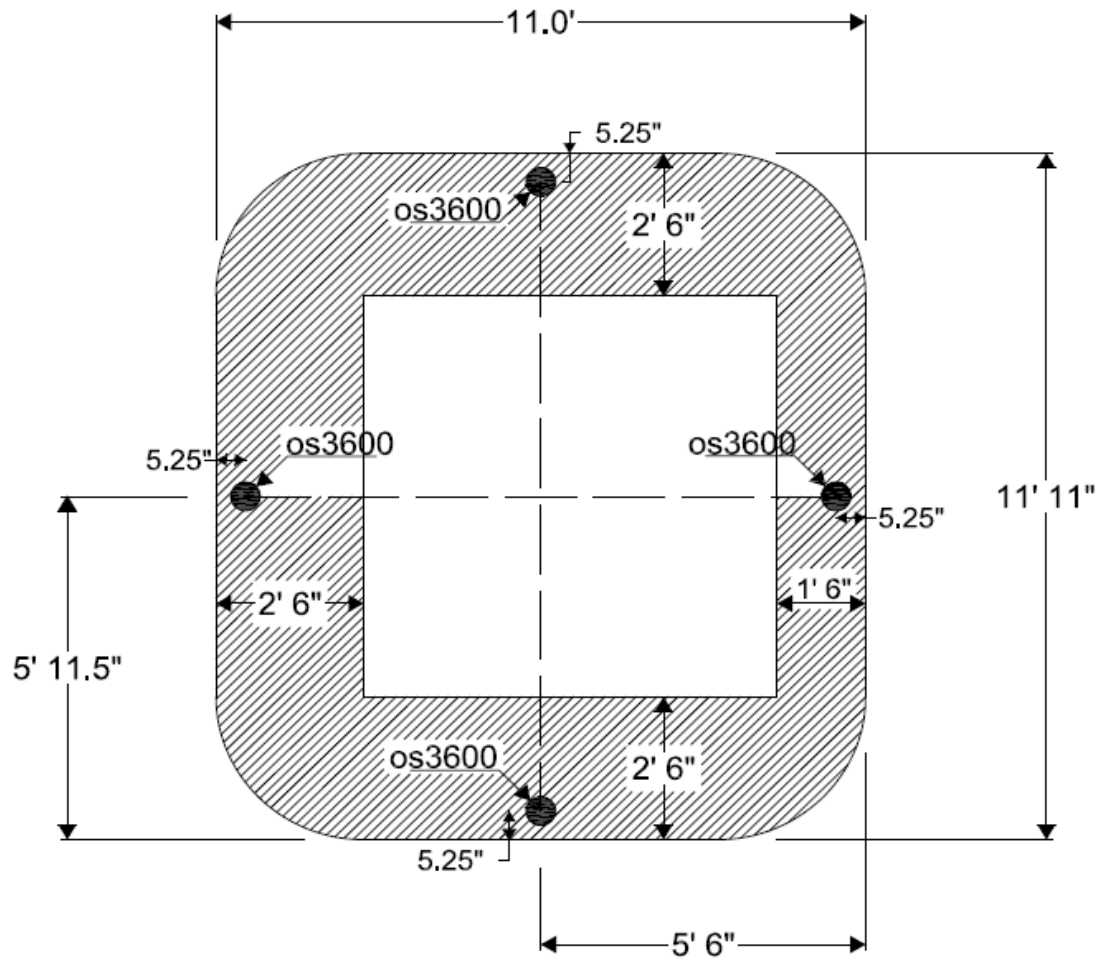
Cross-section of pylons 6 East and 6 West showing location of strain sensors at lift T4 (elevation 115.5')
